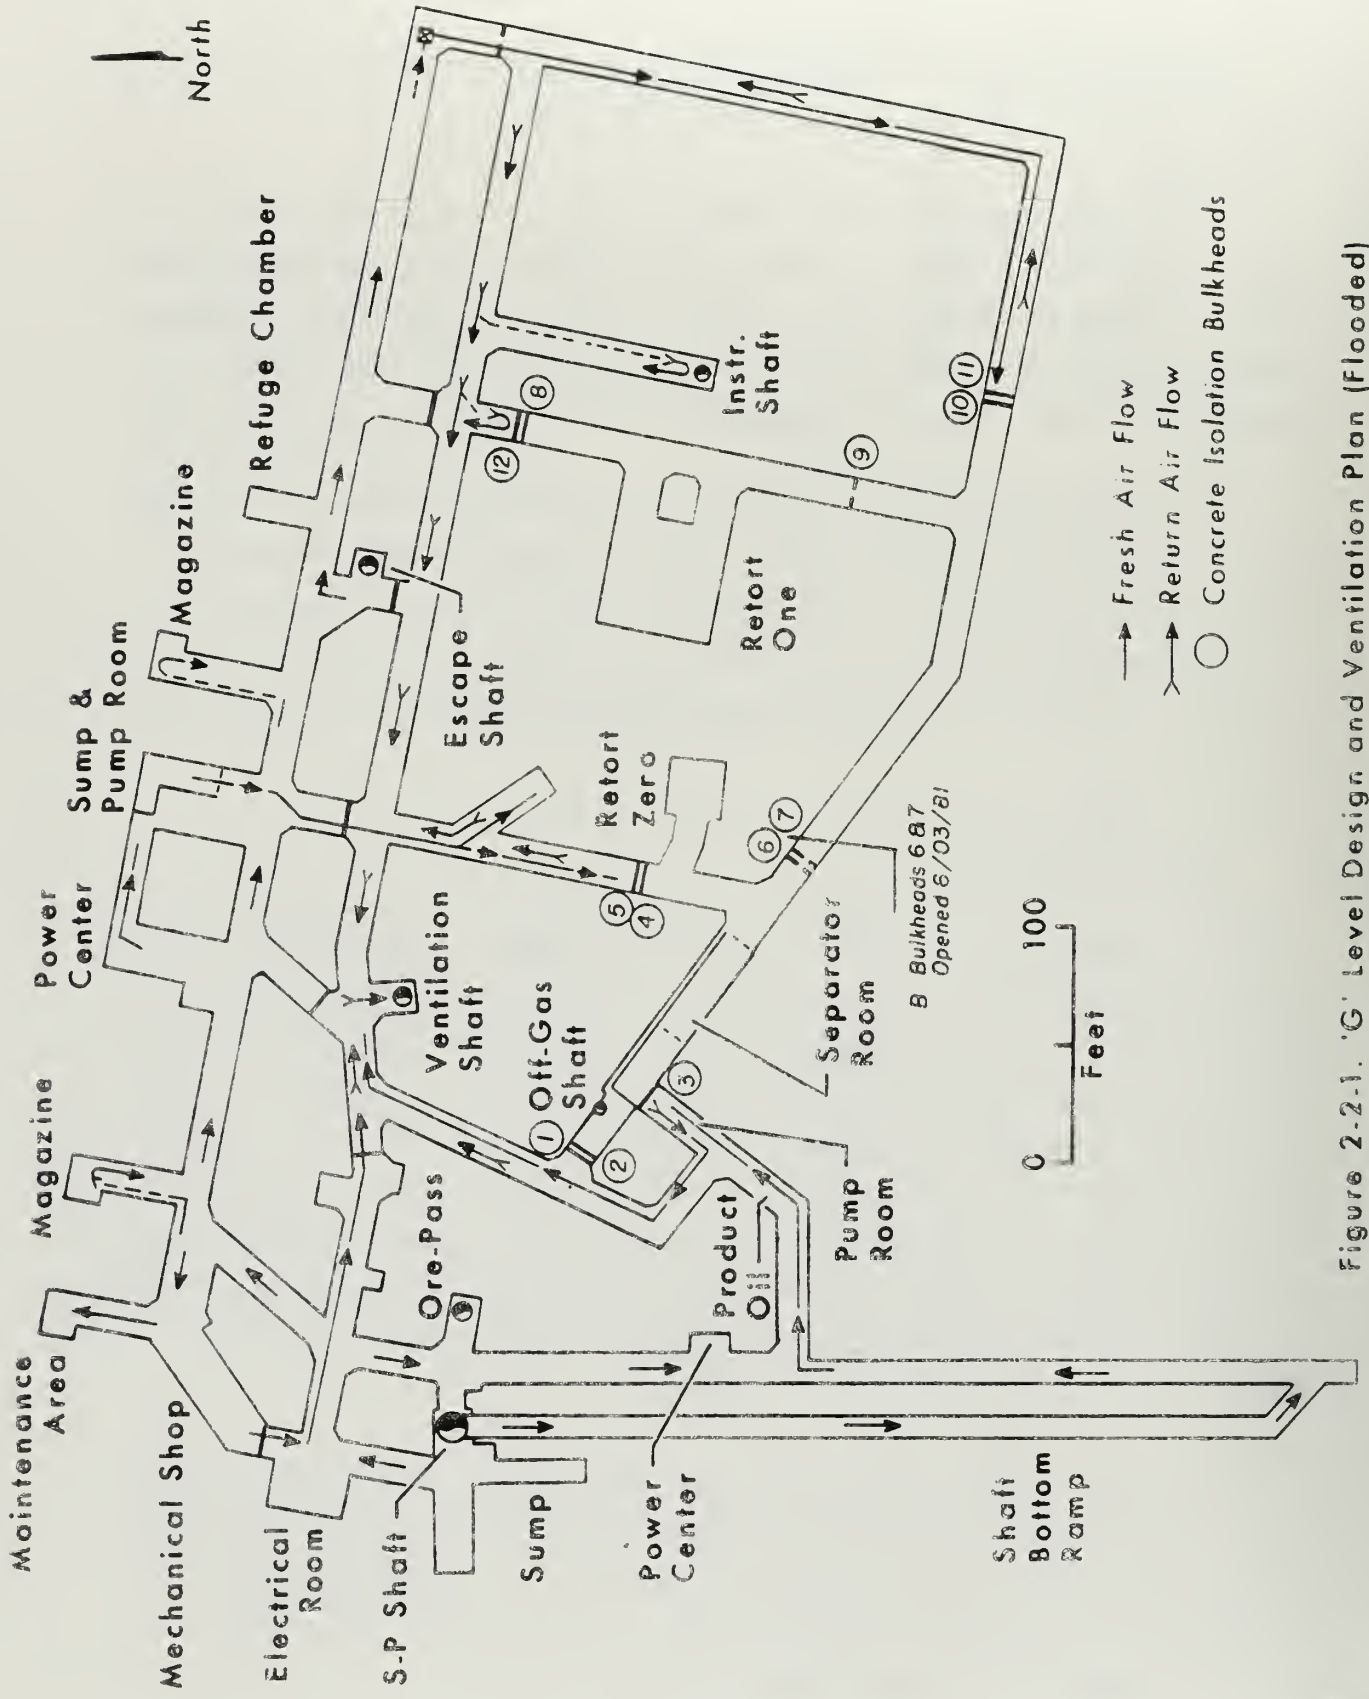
'G' Level Design and Ventilation Plan (Flooded)
